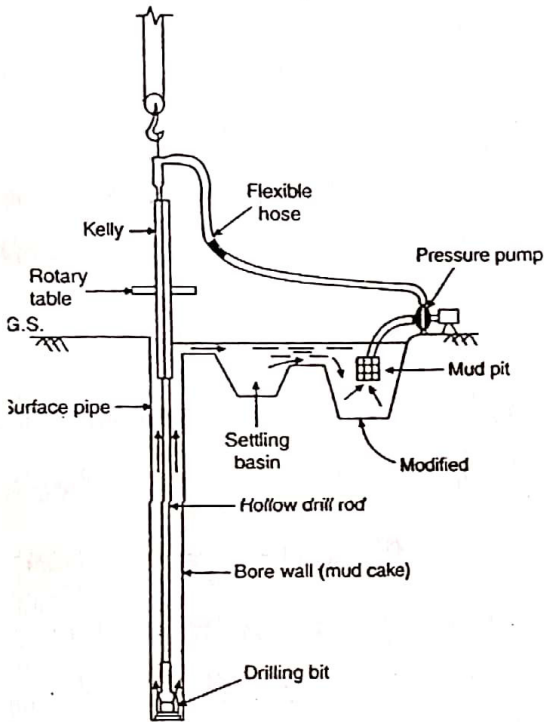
Hydraulic rotary drilling (straight circulation)
